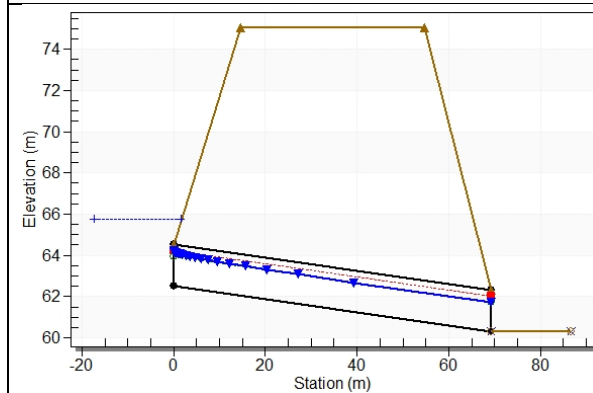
Water surface profile for culvert during 1:100yr rainfall event using one (1) 2m culvert pipe.
